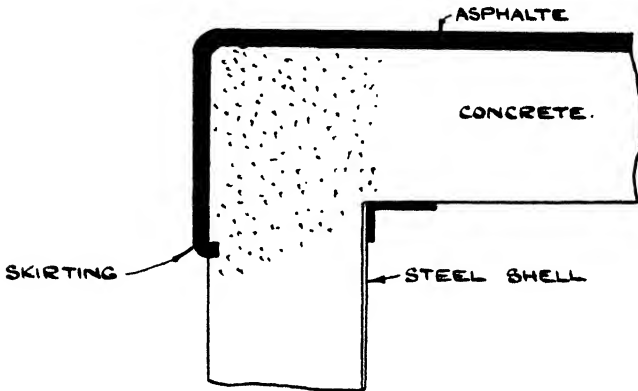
VERTICAL SECTION OF CONCRETE WALL SKIRTING
